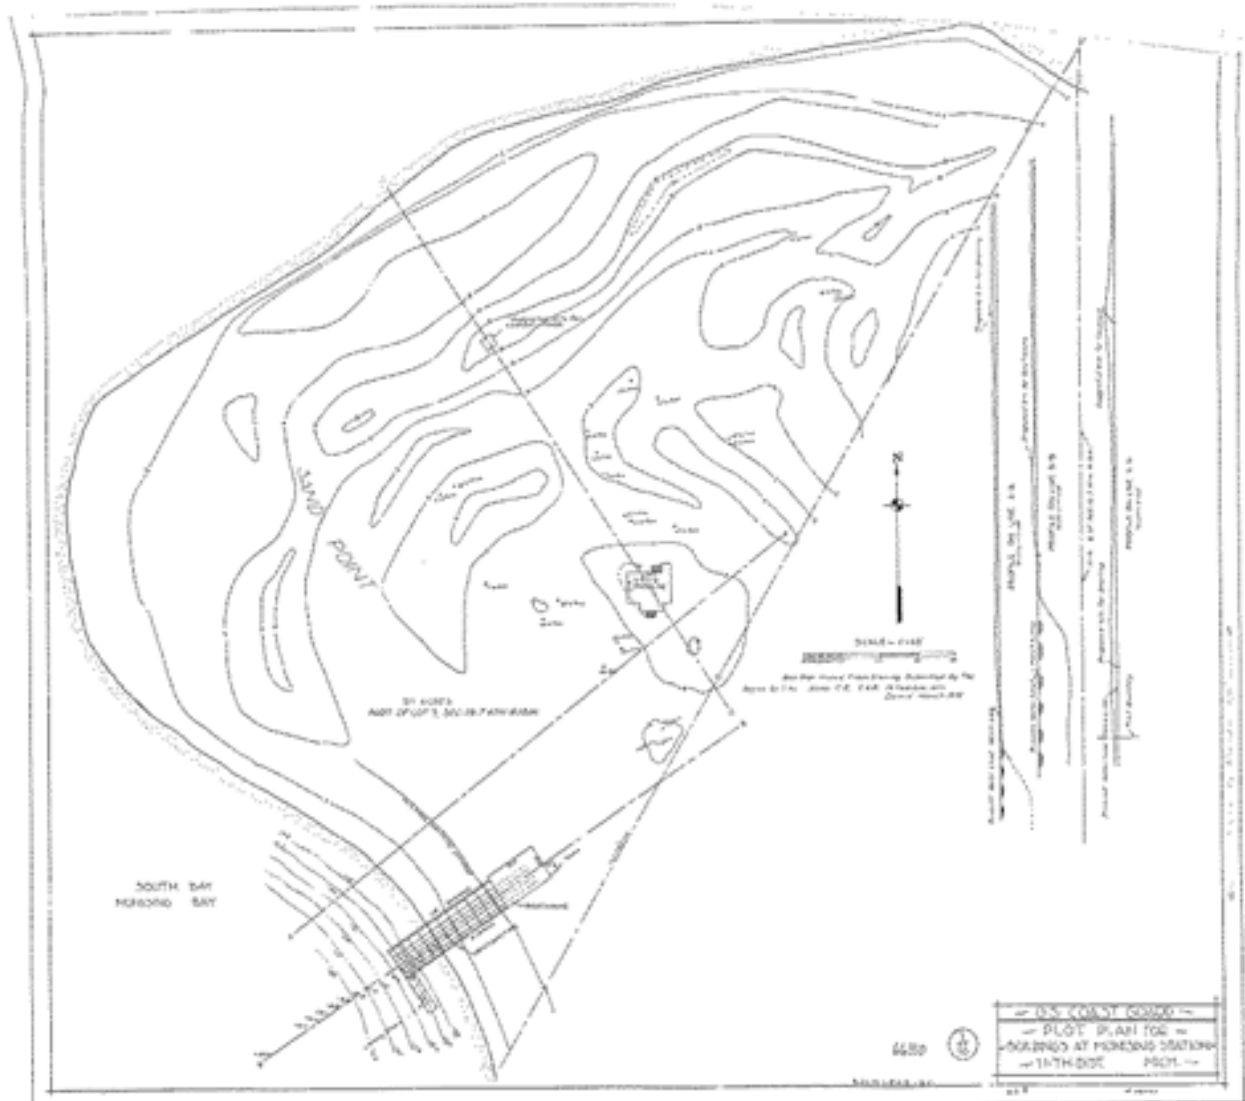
Plot plan of the new station, 1932. (source: PIRO Archives)
